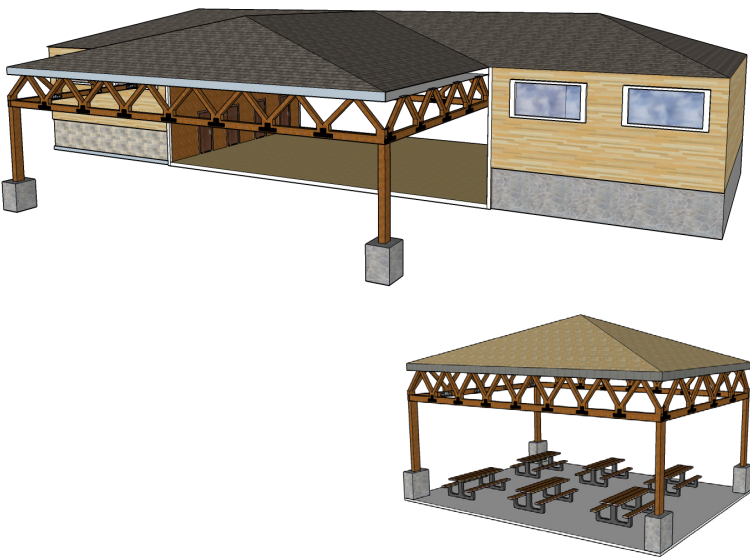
A comfort station (above) containing restroom facilities and an open picnic pavilion
